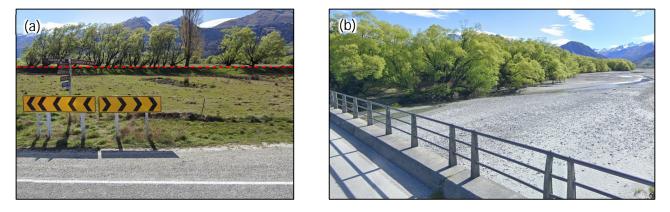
(a) shows a photo of a short section of the secondary floodbank.
